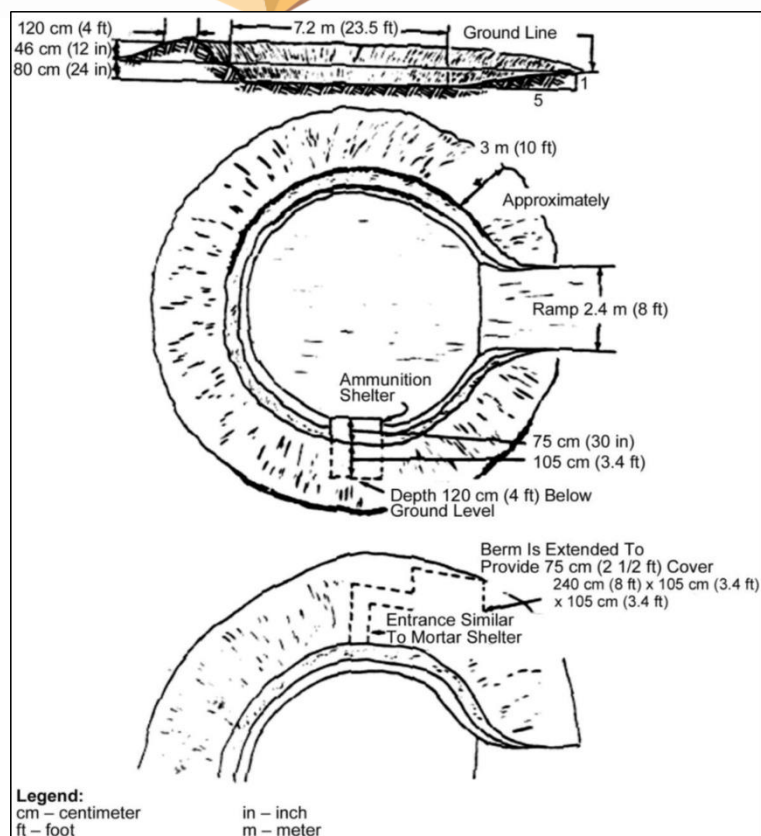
Towed howitzer emplacement (105-millimeter and 155-millimeter howitzer) layout
